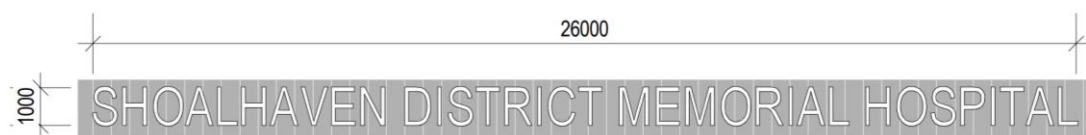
Proposed building identification signage – Main Entrance (south elevation) (Conrad Gargett)
